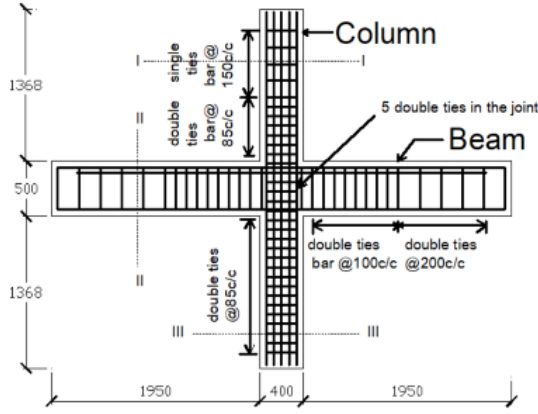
Reinforcement planning of beam-column joint (all dimensions in mm).
